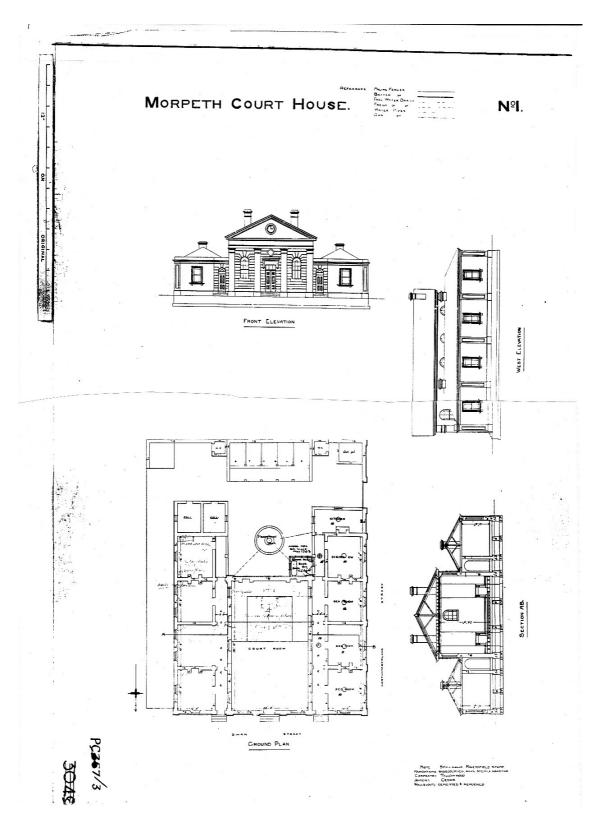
Record of Building Plan for Morpeth Court House (Source NSWPW Plan Room)
